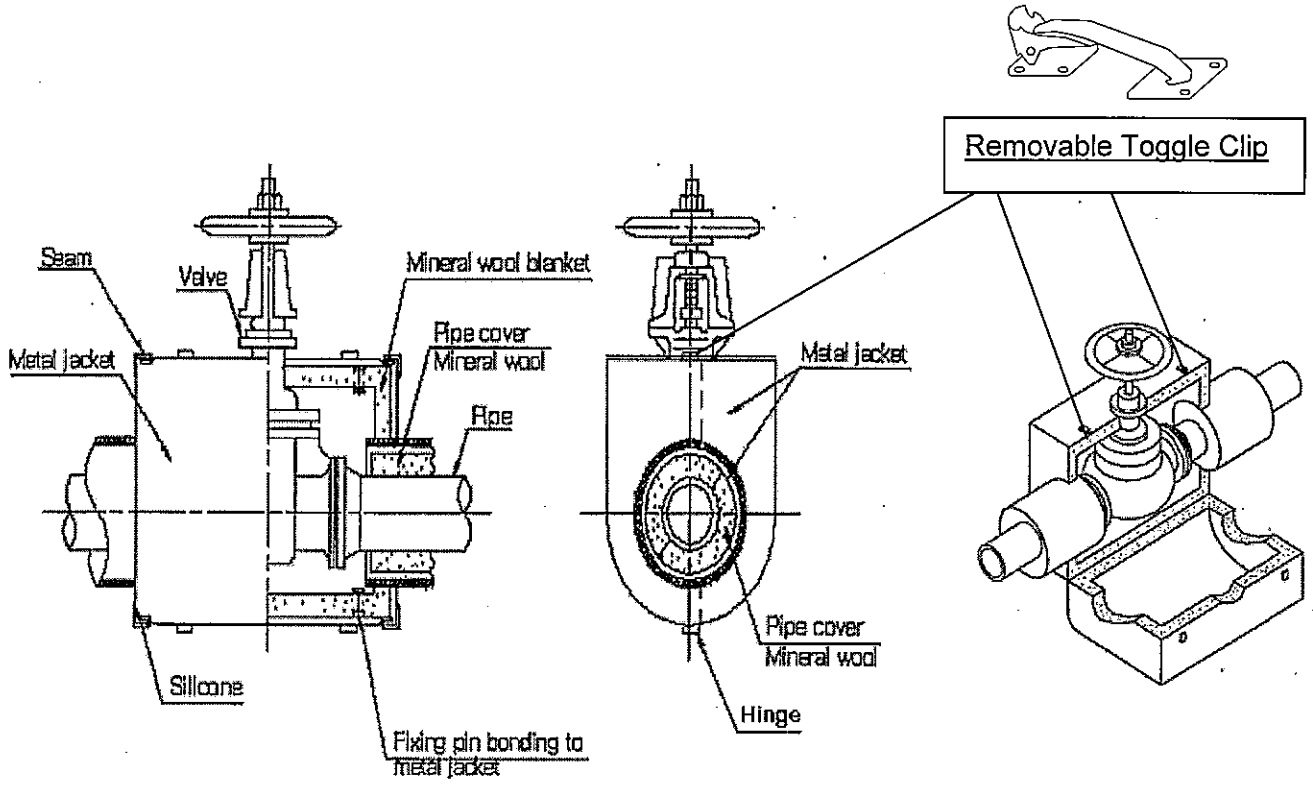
INSULATION FOR VALVE - BOXING OF REMOVAL TYPE
